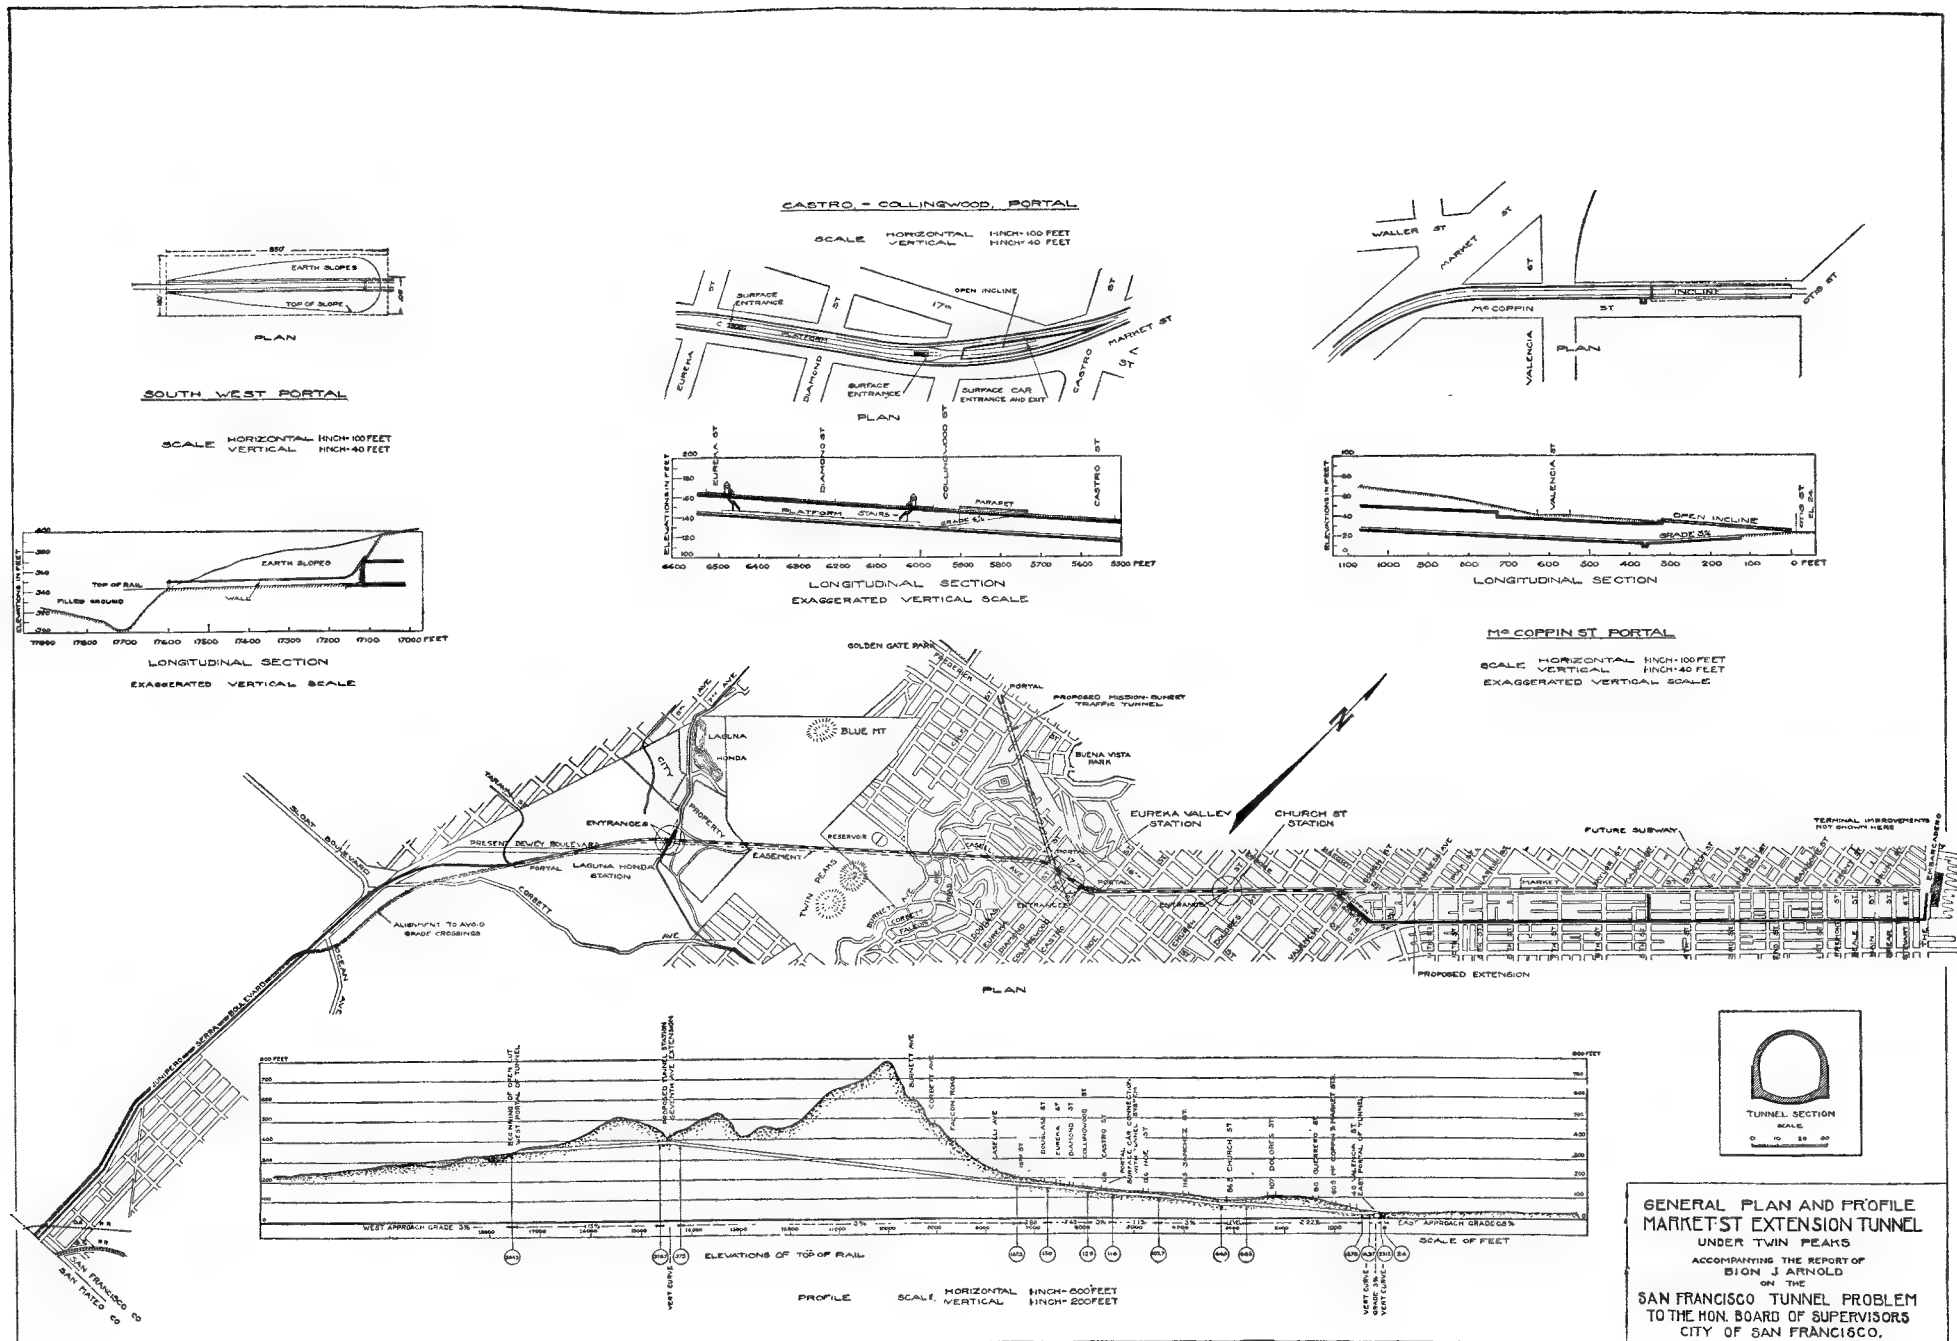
MARKET STREET EXTENSION TUNNEL UNDER TWIN PEAKS, GENERAL LINE PLAN AND PROFILE.
